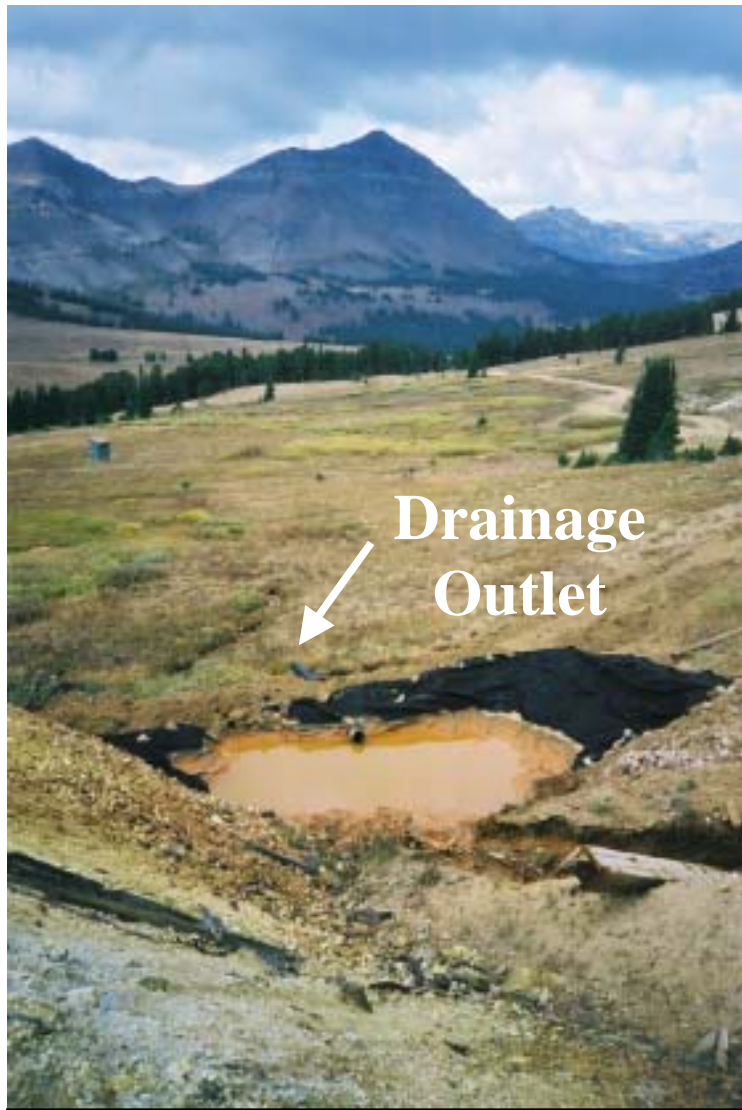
Lower settling pond showing outlet adjacent to waste rock dump of the Winter Tunnel.
